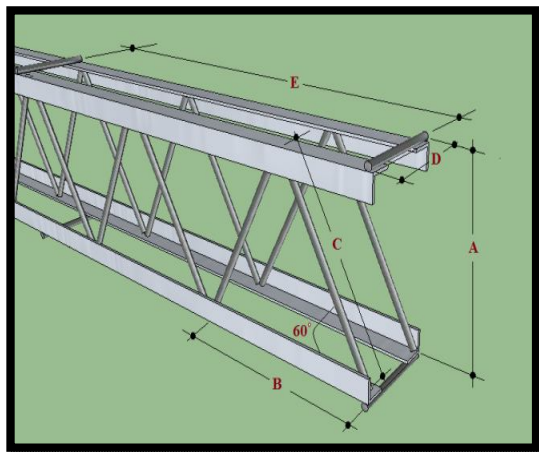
Modified Beam Reinforcements: A) Height B) Web member spacing C) Length of web D) Width E) Support spacing
